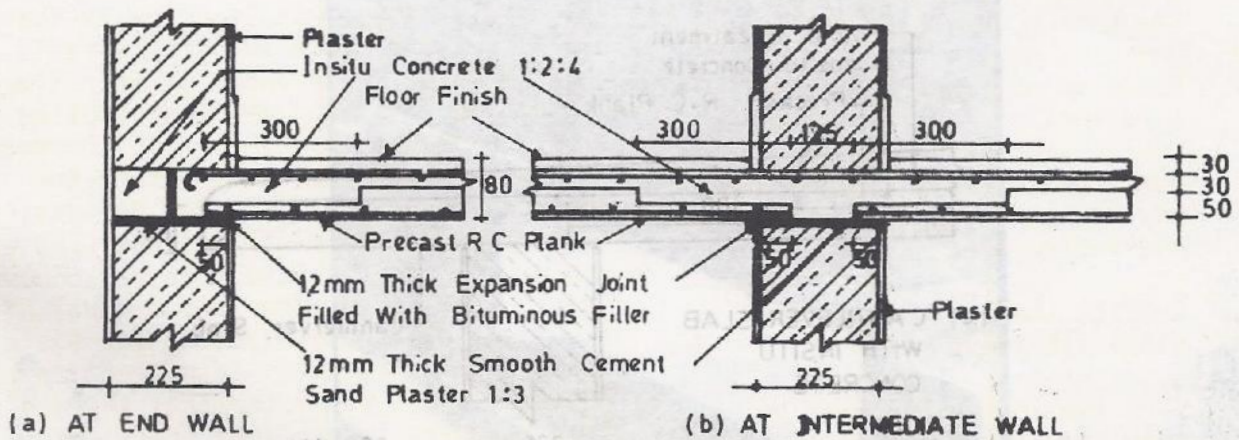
DETAILS SHOWING BEARING OF PLANKS OVER WALLS
